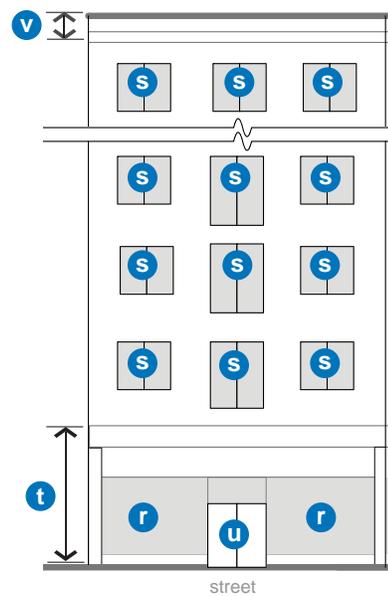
(3). Storefront Building: Street Façade Requirements.
